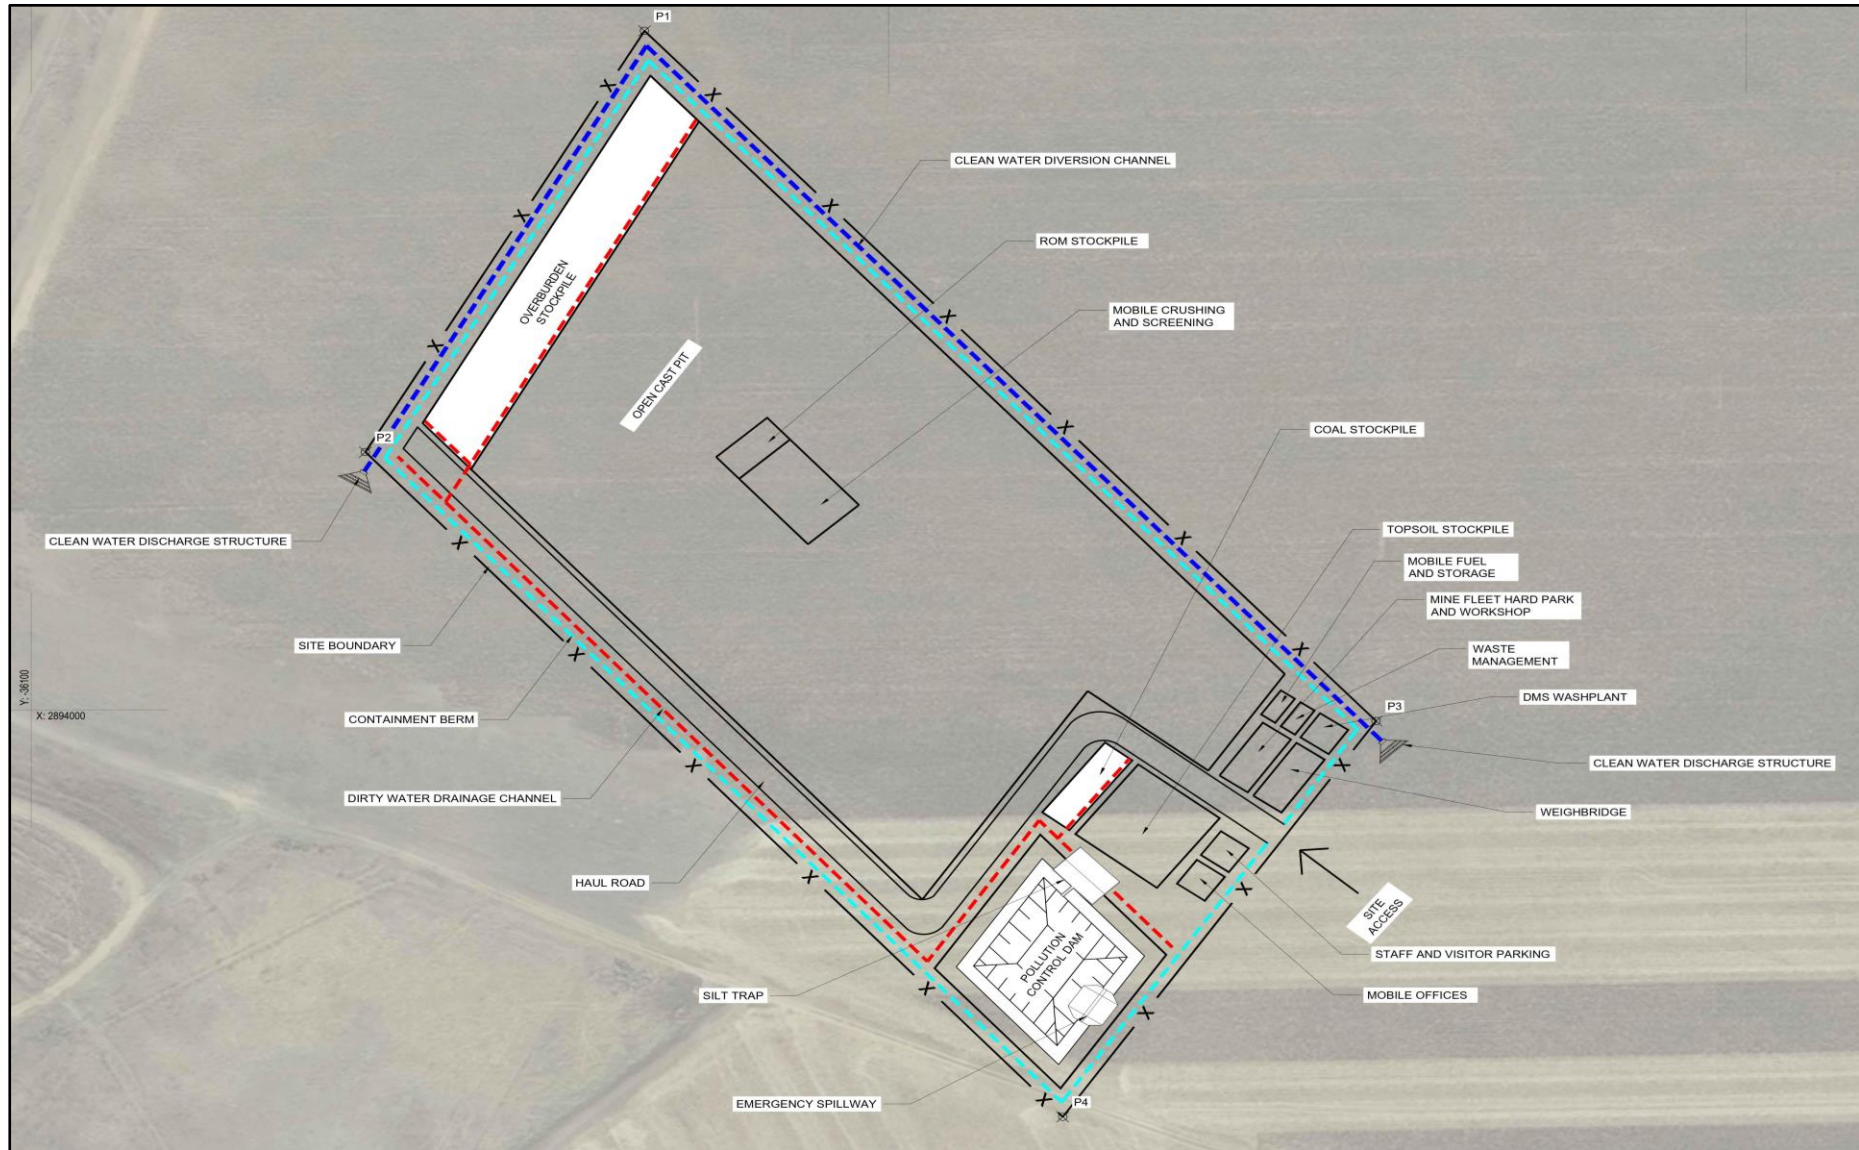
Proposed layout of the newly proposed Vlaklaagte Colliery as provided by Eco Elementum (2020).
